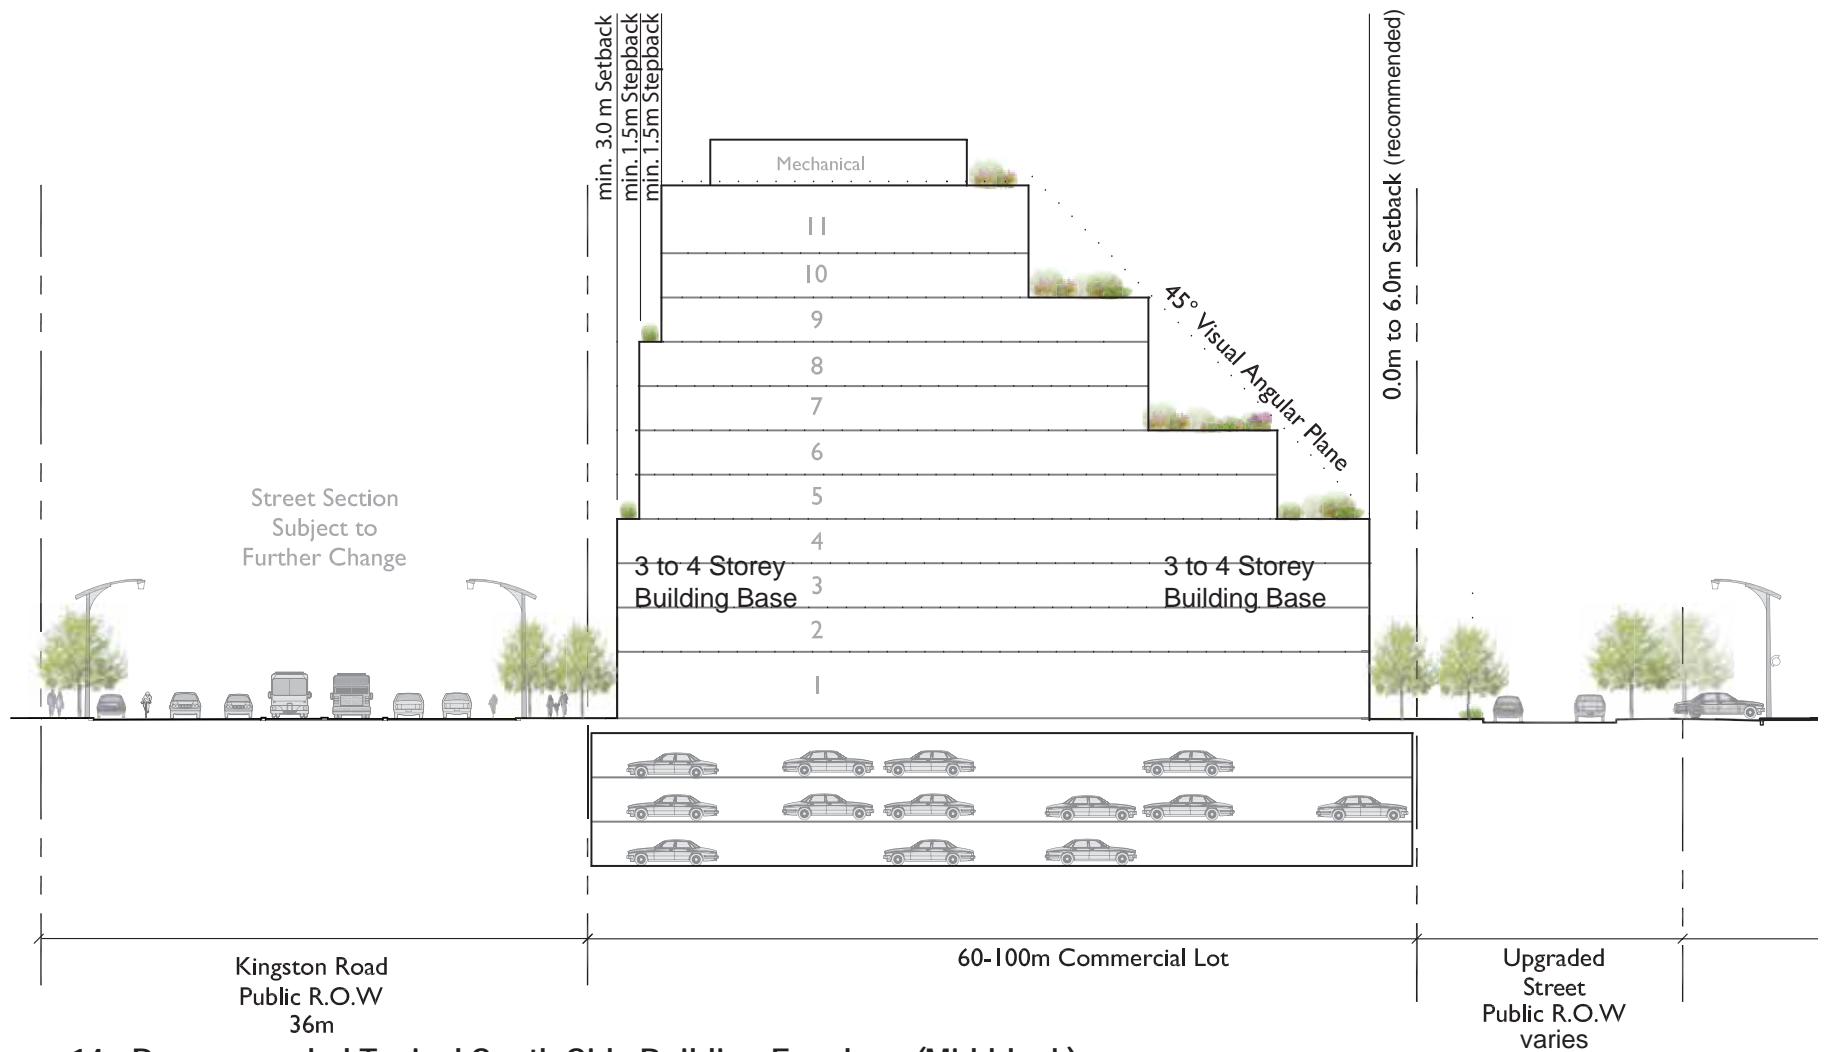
Recommended Typical South Side Building Envelope (Mid-block)
